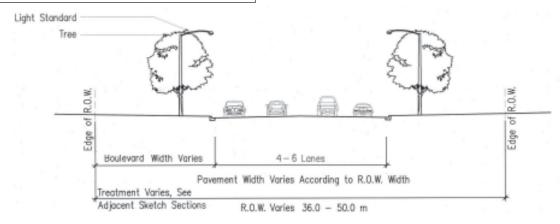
a - Existing Arterial Prototype Section at Built-up Areas
